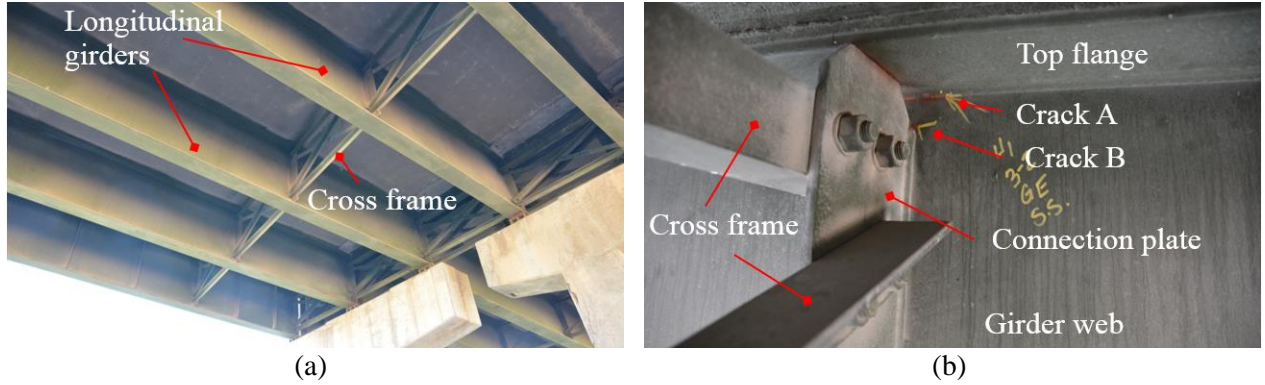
(a) A typical structural layout of a steel girder bridge in the field; and (b) representative distortion-induced fatigue cracks at the web-gap region.
